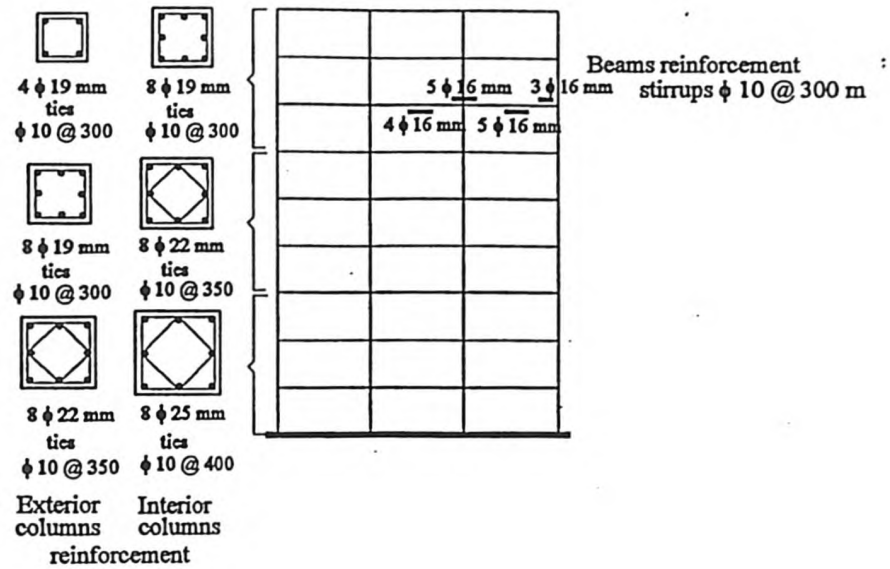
The reinforcement of the columns and beams (Biddah, 1997)
